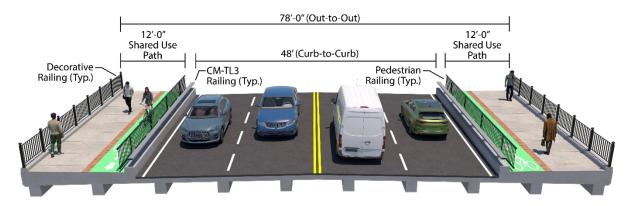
The new bridge bridge's cross section provides separate travel ways for all modes.
